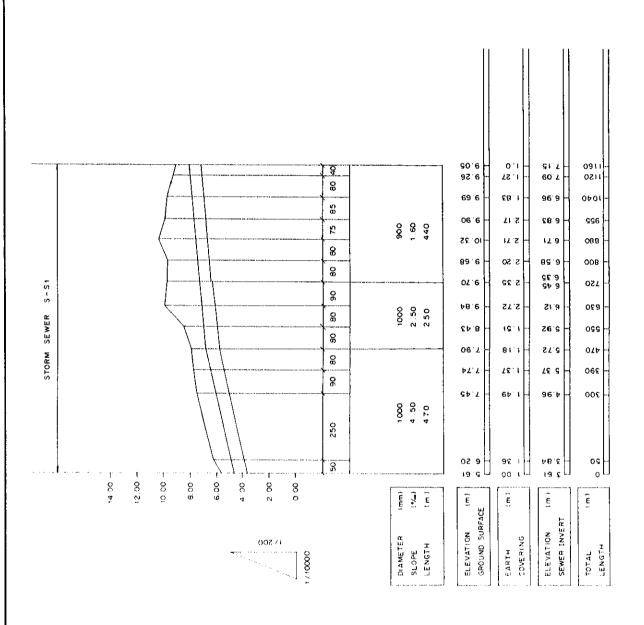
PROFILES OF DRAINAGE CHANNELS (CP.1-1)
